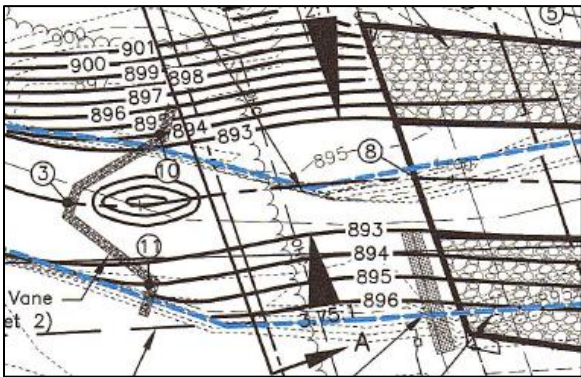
The construction plans. Note the narrow bed width between the vane and the bridge.
